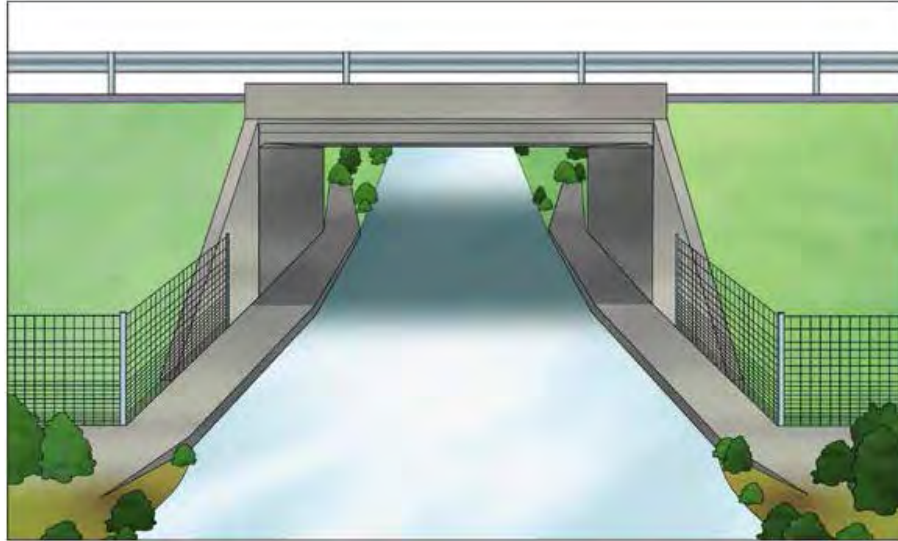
Diagram of a culvert adapted for terrestrial wildlife.
